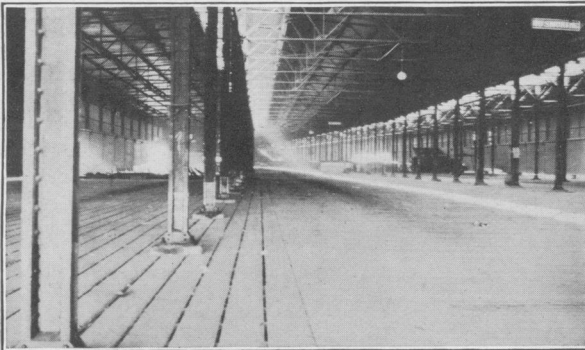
INTERIOR VIEW OF SHED SHOWING OPENINGS IN FLOOR. THE BULKHEAD IS ON THE RIGHT SIDE OF THE DRIVEWAY NEAR THE ROW OF COLUMNS.
